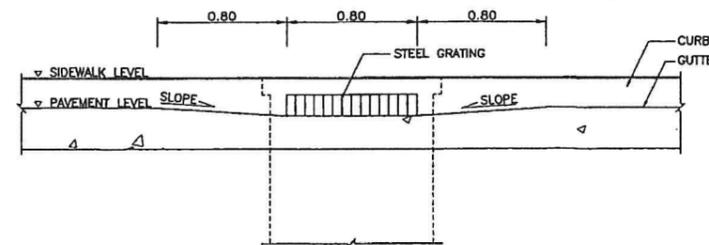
DETAIL OF CURB AND GUTTER OR CURB AT RAISED MEDIAN
